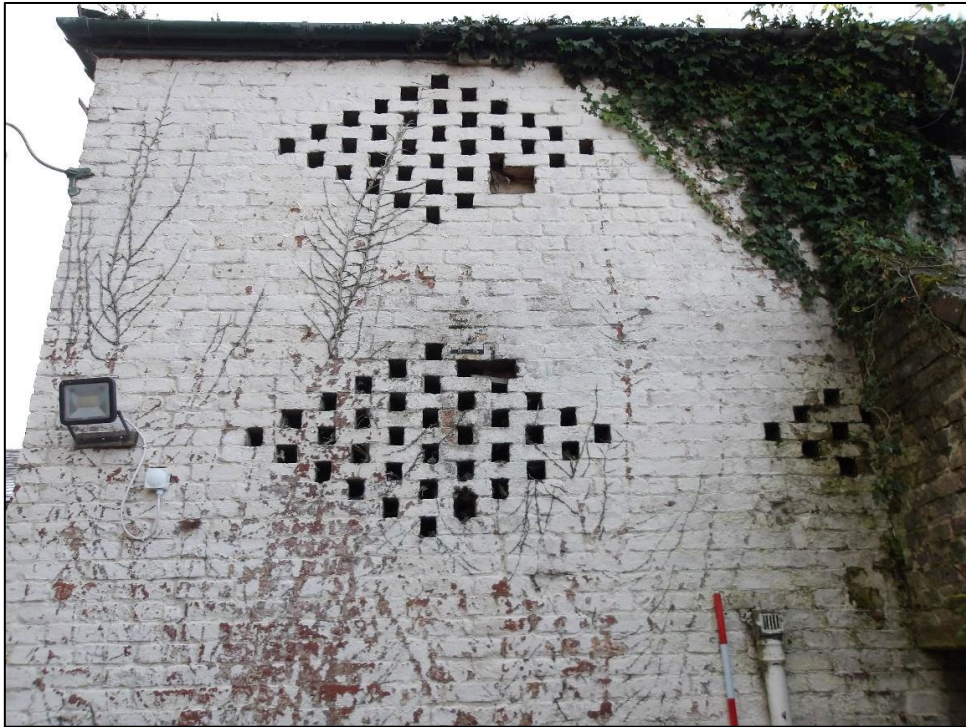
View of diamond-shaped ventilation openings. Northeast facing section of coach house. 2m scale
